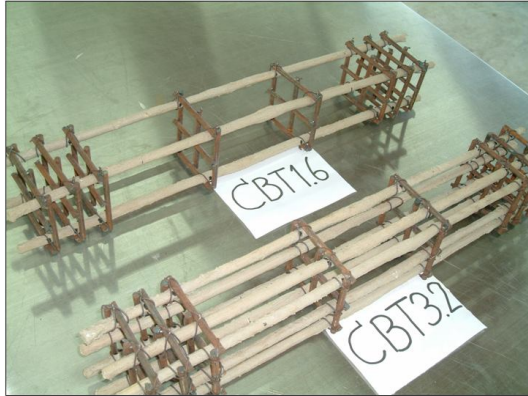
Two specimens of treated bamboo reinforcement (CBT1.6 and CBT3.2)
